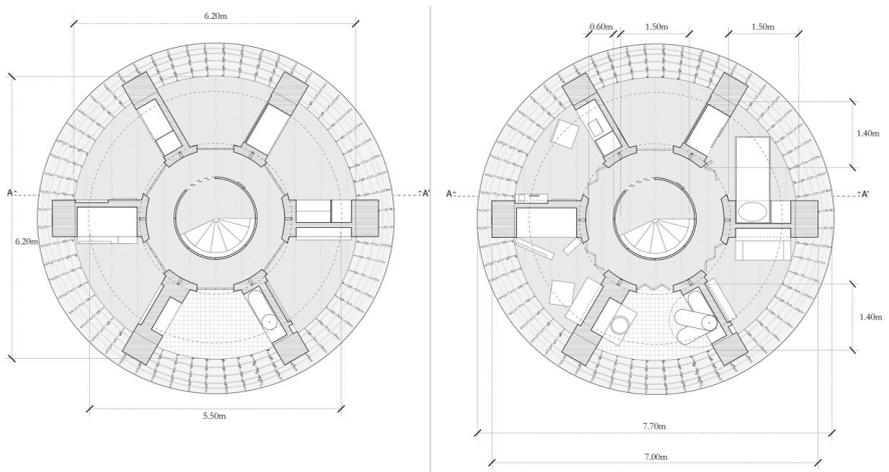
Floor plans in deployed and non-deployed condition of architectural elements
